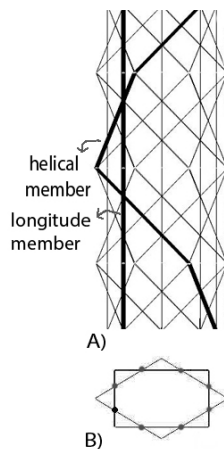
Isotruss structure. A) Elevation. B) Plan (Gavade et al. 2016)
